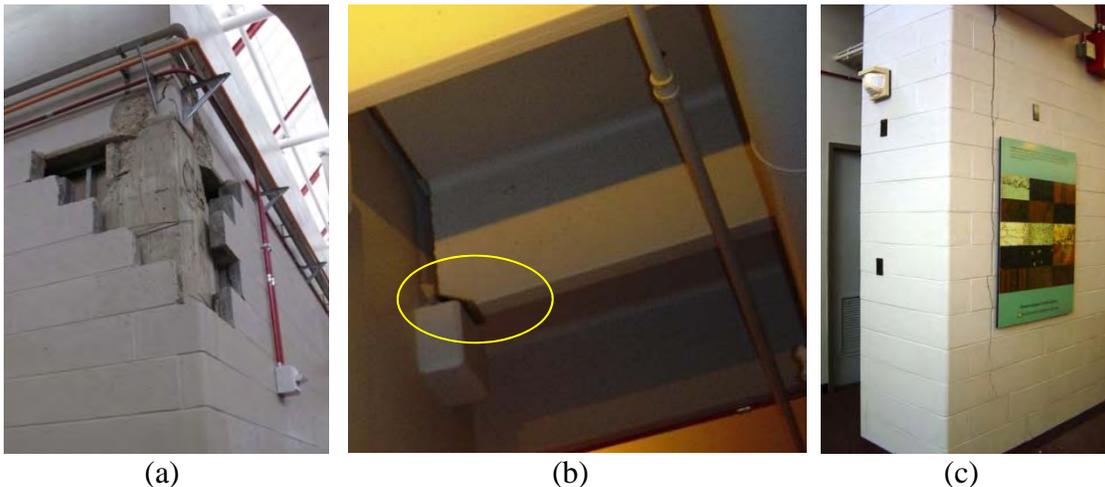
Representative damage in concrete and masonry structure: (a) RC beam-column joint failure; (b) sliding of reinforced concrete T-beam at roof; (c) cracking of CMU wall
